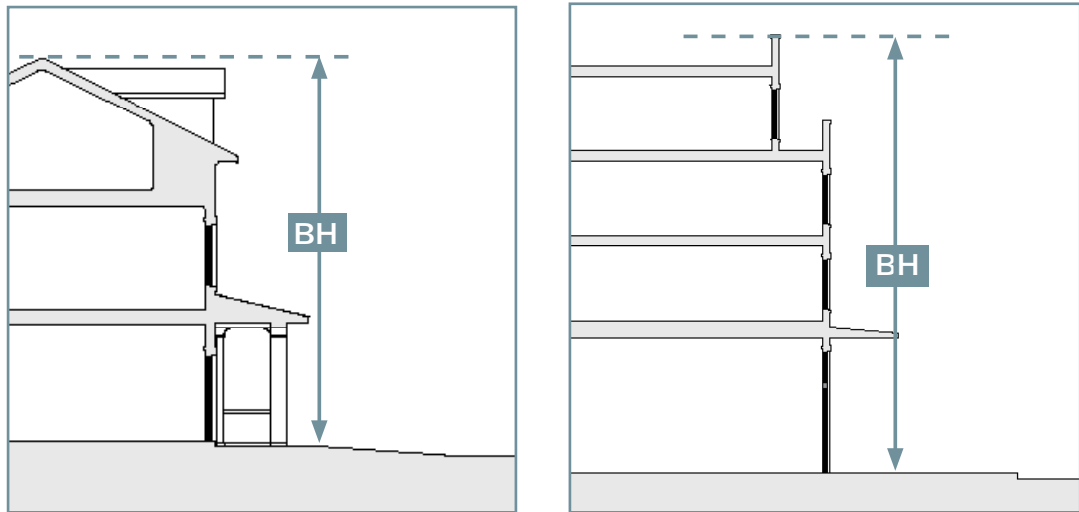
Graphic showing how to measure the building height (BH) of a pitched-roof building (left) and a flat-roofed building (right).
